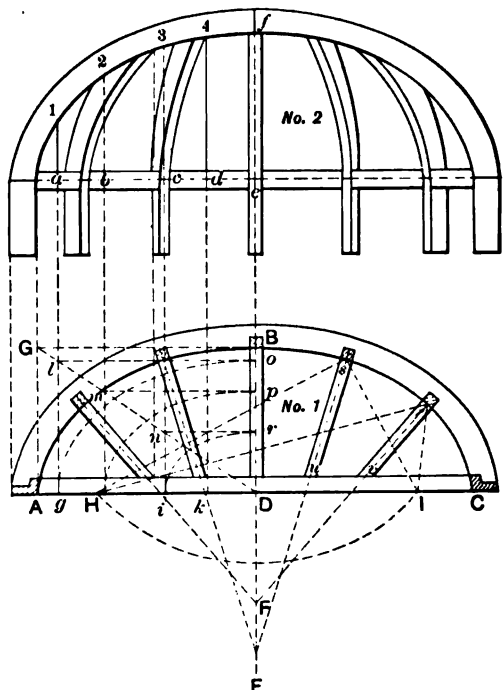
Laying Out the Ribs of a Niche Elliptical in Plan and Elevation, the Ribs Standing at Right Angles to the Curve of the Plan.
